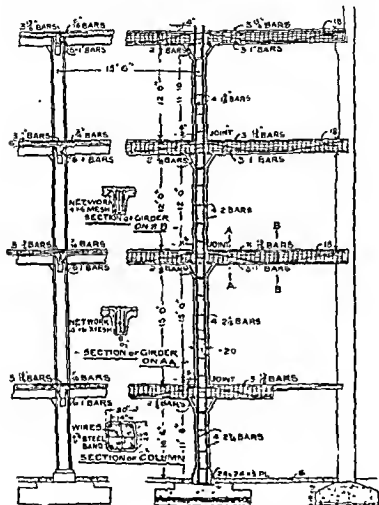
A Chicago Warehouse (Sectional Elevations).
